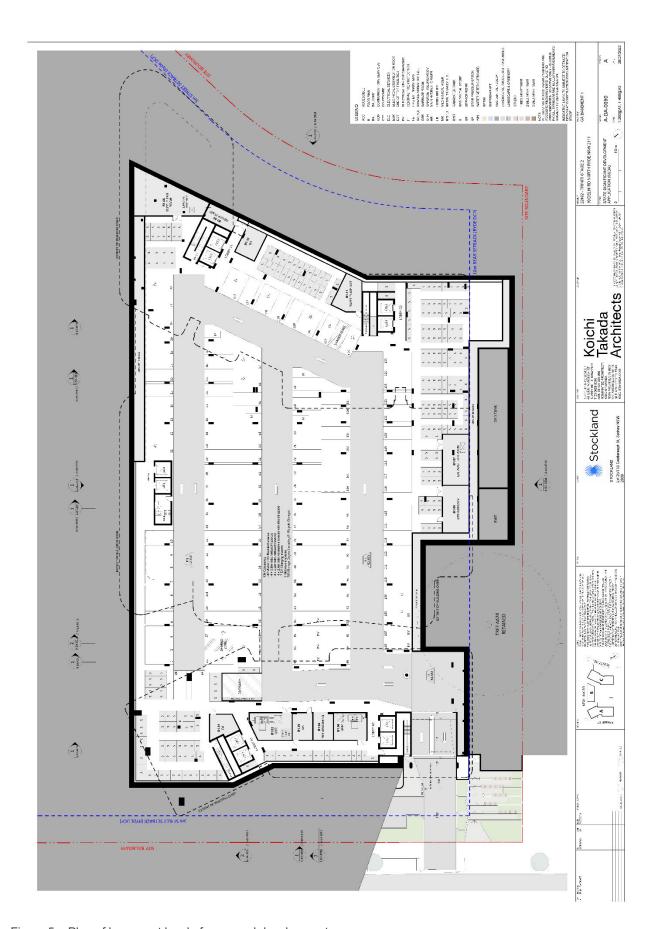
Plan of basement level of proposed development Source: Koichi Takada Architects
